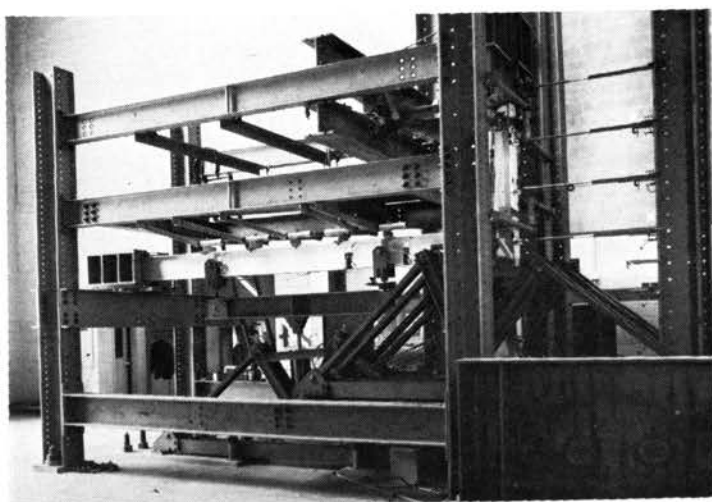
Overall view of test setup for test specimens RC-1 and RC-3
